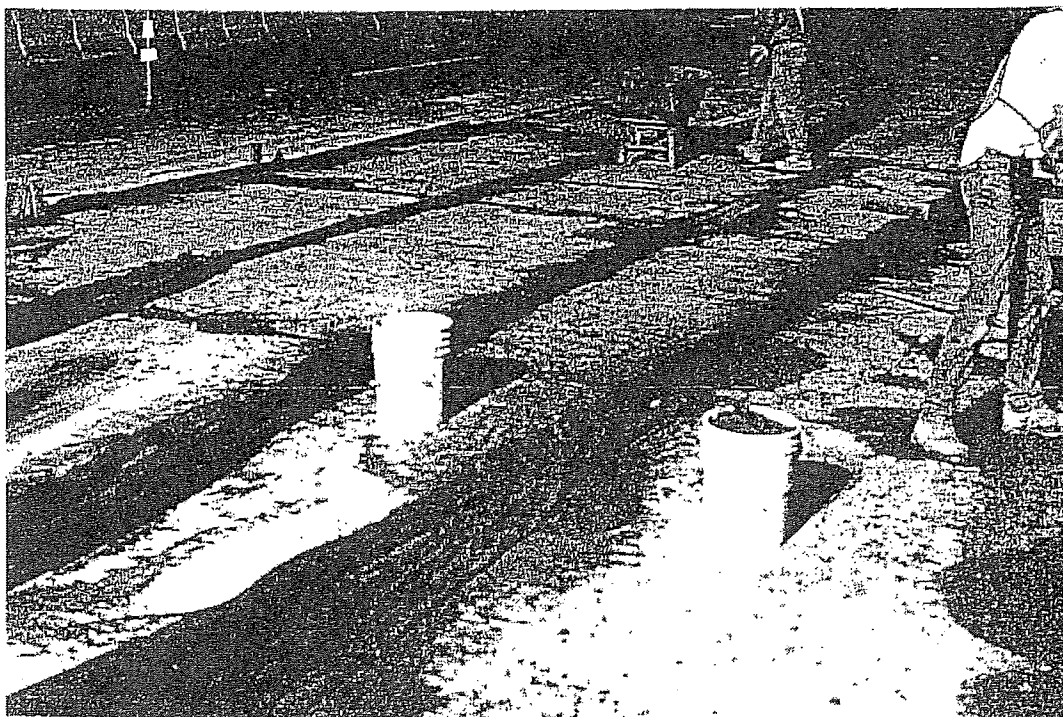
Curing of Rapid-Setting Concrete at Stringers and Transverse Joints [3]
